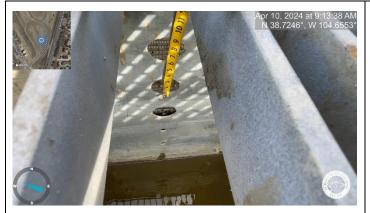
Pond Outlet Structure: Install orifice plate with the proper sized holes. Reference Sheet 30 of the Construction Drawings.
